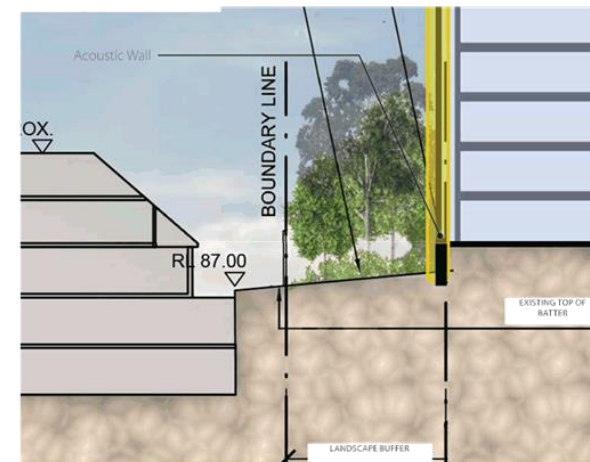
Detail of Section C-C, showing public realm concept plan for Westfield Drive interface - adjoining 36 Westfield Drive (Floor levels are indicative only)
